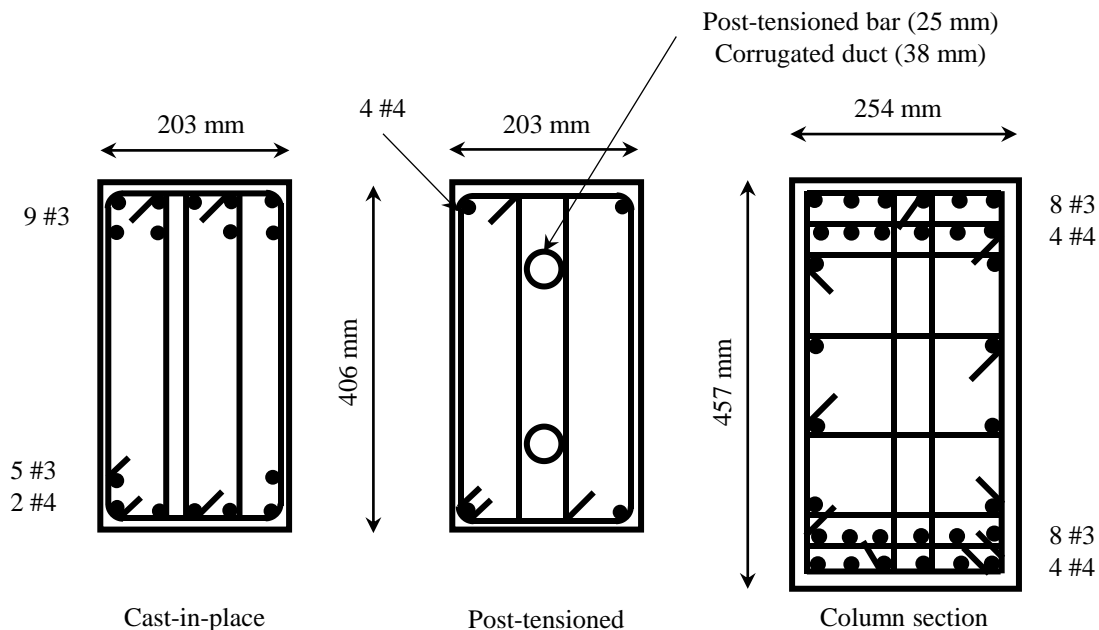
Zone 4 beams and columns studied by Cheok and Lew [4] (adapted from [4]).
